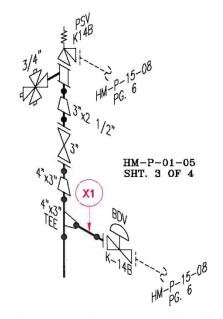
A partial view of isometric drawing HD-P-01-05, sheet 3 of 4. The location of profile radiography (X1) is shown in red.
